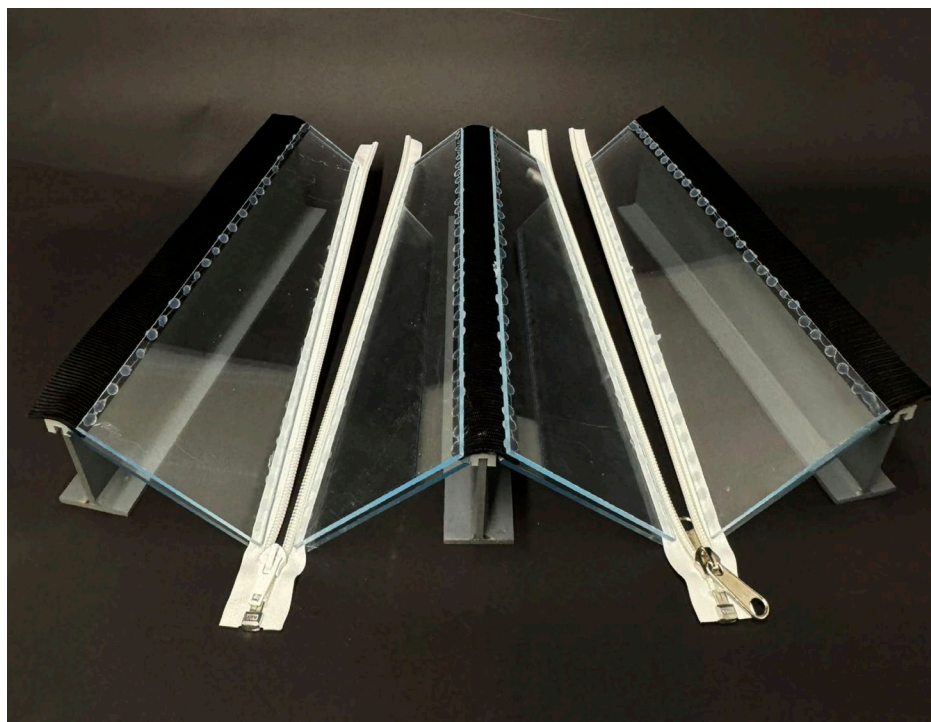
Glass folded structure serving as a roof canopy © Huhle, Lob, Riebe.
